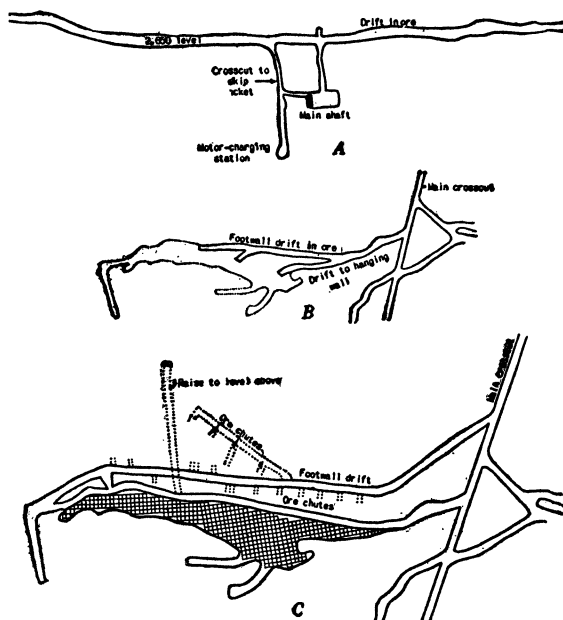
A, Plan of level, Morning mine, Idaho; B, partly developed level in wide ore body, Bunker Hill & Sullivan mine; C, complete development of sill floor, showing ore chutes for higher floors, Bunker Hill & Sullivan mine.
